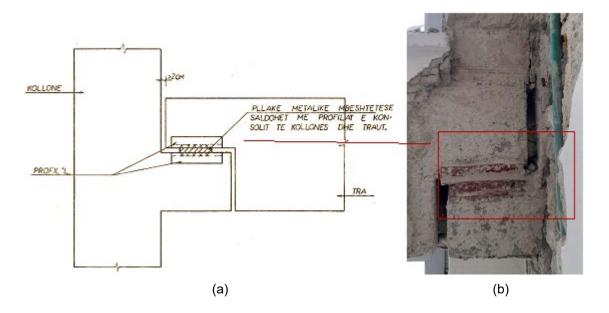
Beam-column connection in a PRCFB (National Territory Planning Agency building in Tirana): (a) a connection detail according to the original design (source: AQTN, 1999) and (b) as constructed (photo: Markel Baballëku).
